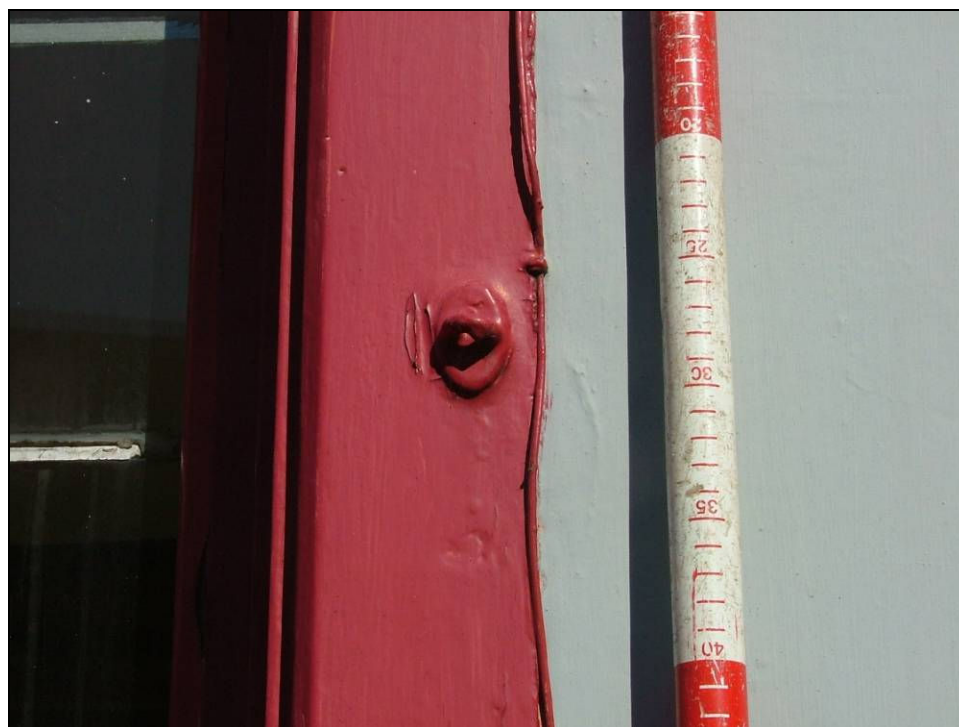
Detail of metal plate for a hook or canopy, window frame, east elevation
